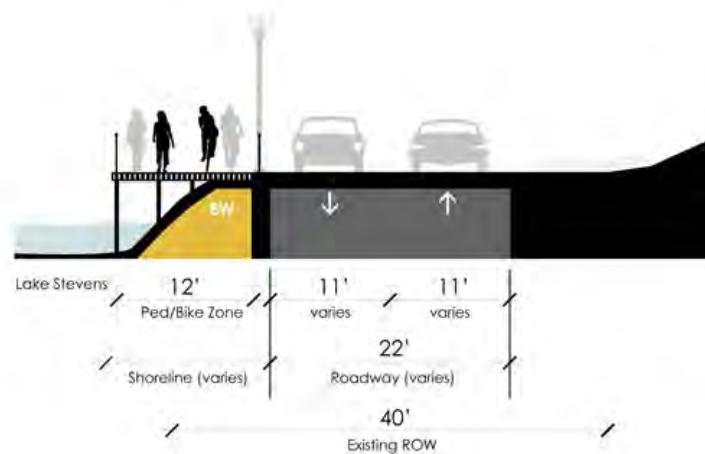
Potential Street Section: Lake-side Boardwalk
